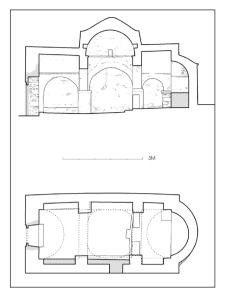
Panagia at Athalassou. Plan and longitudinal section.
